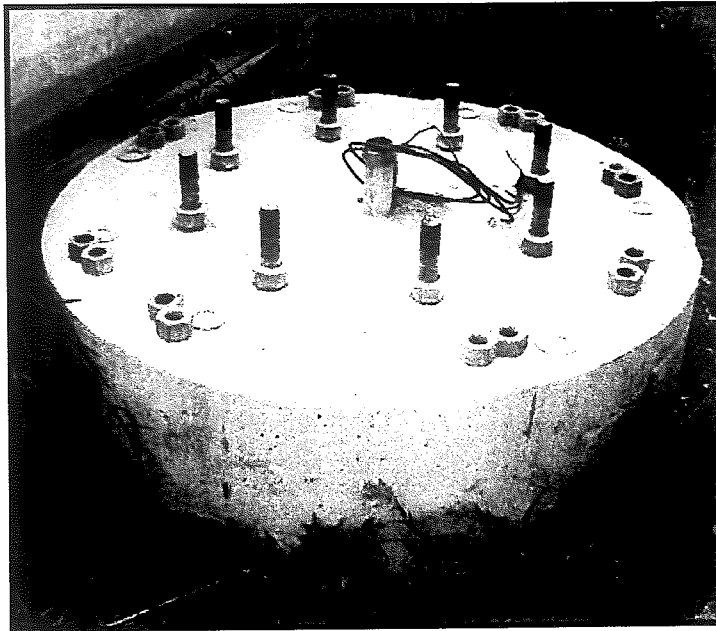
Concrete Foundation and Anchor Rod and Leveling Nut System
